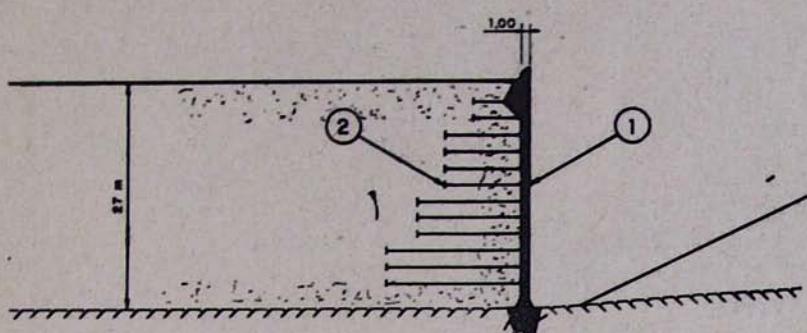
Typical section through Mur à Echelles; 1—Cast-in-place wall; 2—Anchor members with end anchor plates.
